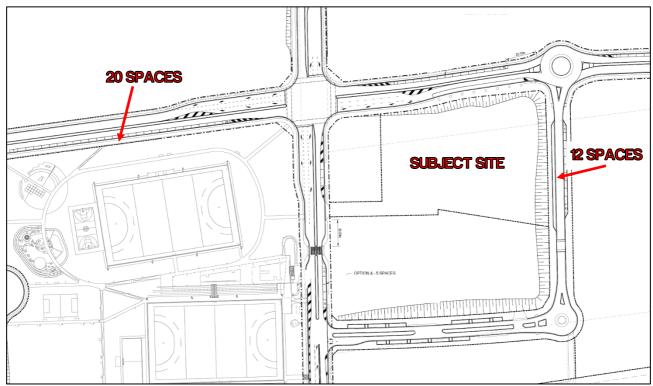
Proposed Pick-Up / Drop-Off Facilities
